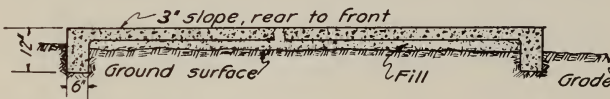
Cross-section of floor and foundation. Note slope of floor and thickness of foundation wall, also fill under floor.
